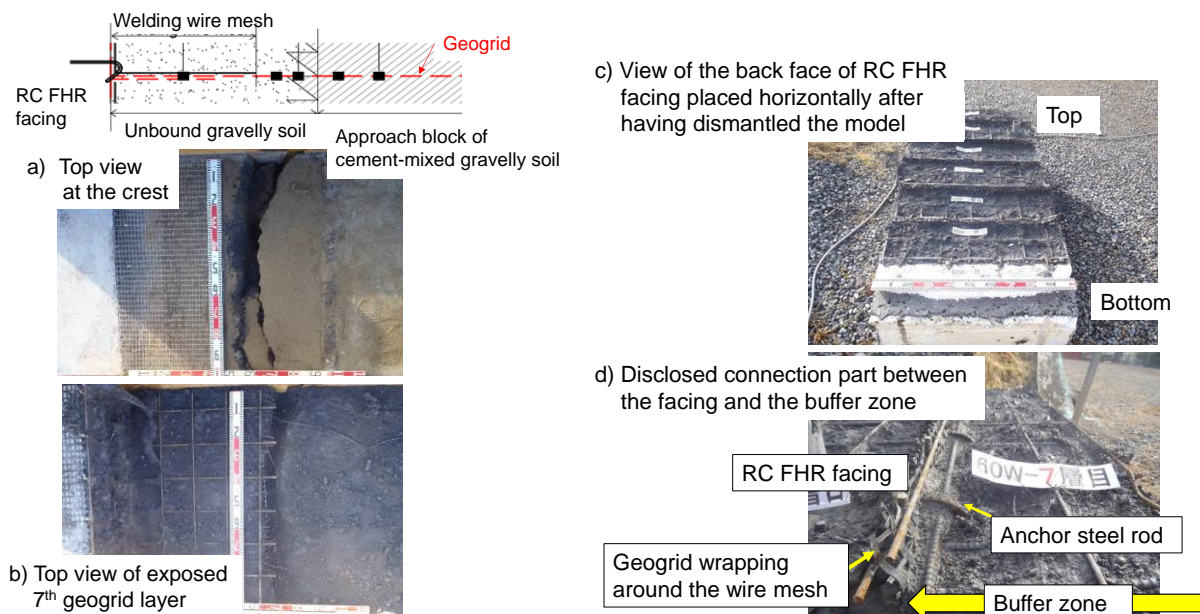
Internal structure seen by excavation after loading tests in Case 4.
